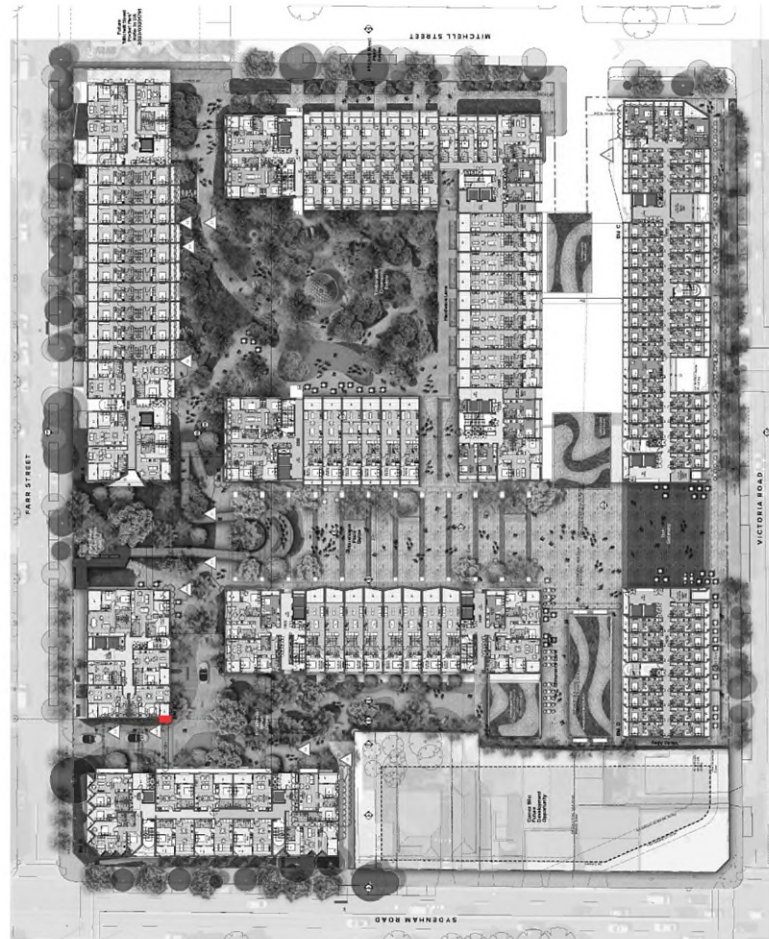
Suggested Treatments – Level 01 to 03 Plan (typical plan shown)
